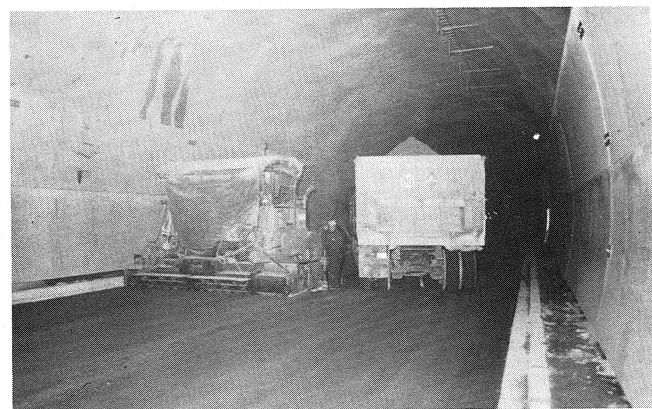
Construction of the Cadi Tunnel RCC pavement
